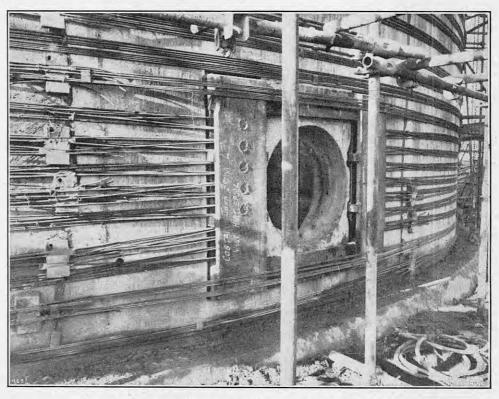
MANHOLE FRAME NEAR BOTTOM OF SAND-TRAP TANK-
